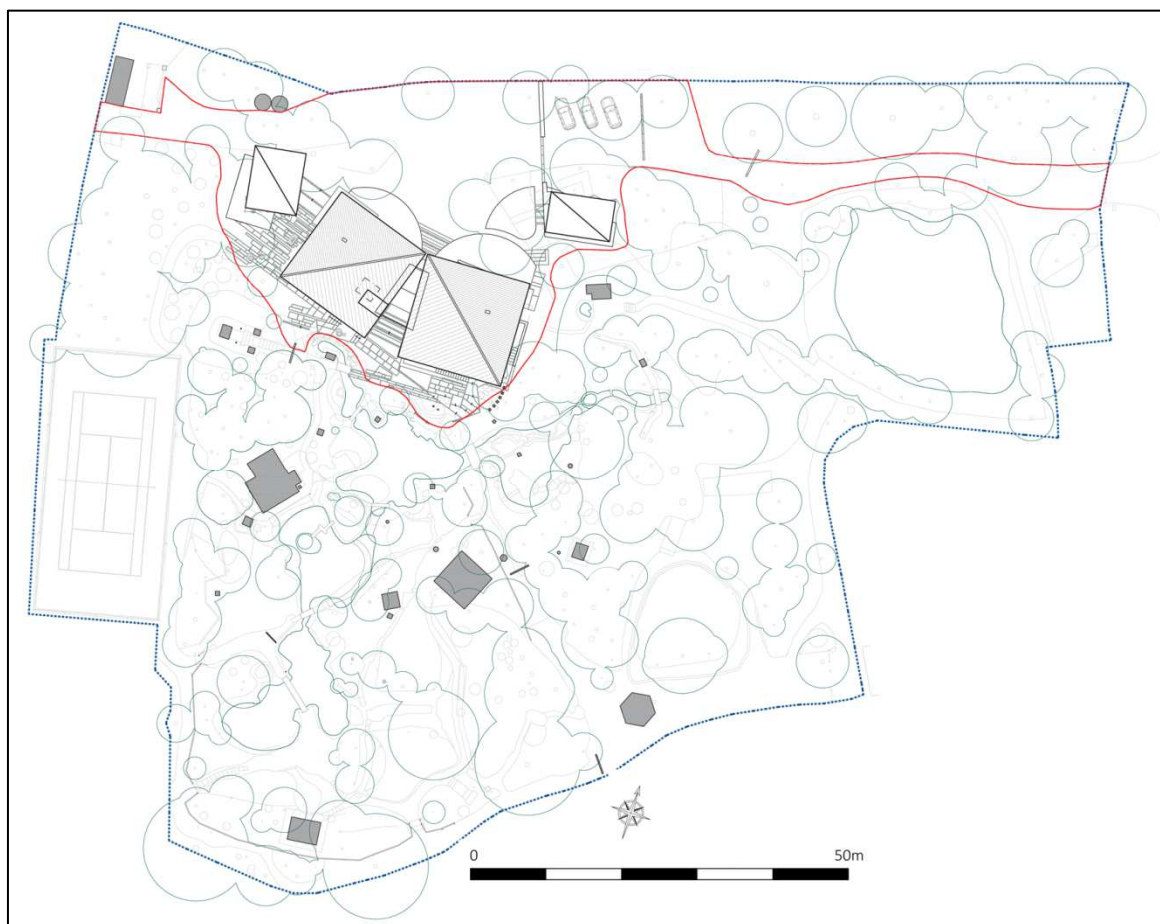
Proposed development (scale as shown), with external, new landscaping pending further planning submissions
